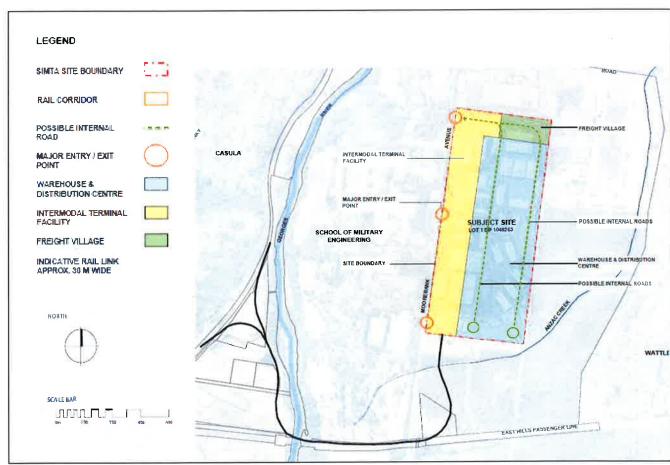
The MPE Approved Concept Plan layout (Source: MP 10\_0193)
